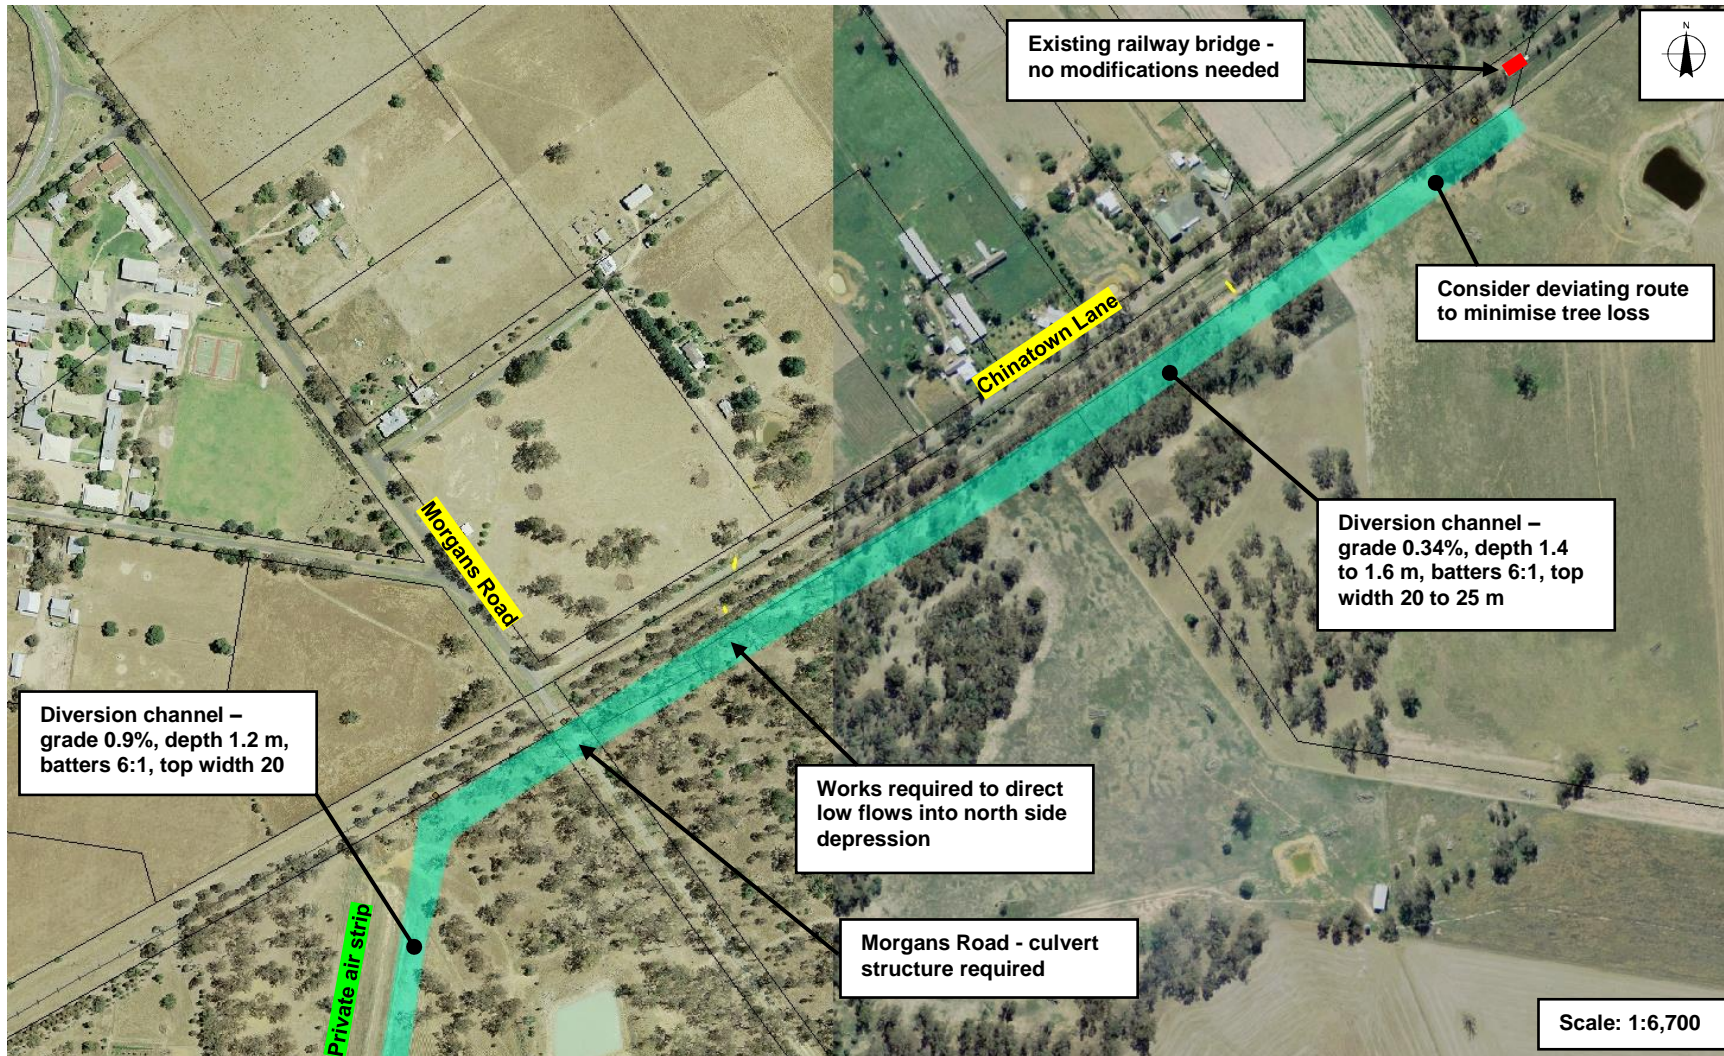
Queen Street Waterway Diversion Channel – Plan of Lower Route
